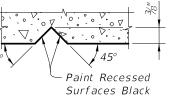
## DETAIL "B" - SECTION AT INTERMEDIATE OPEN JOINT
